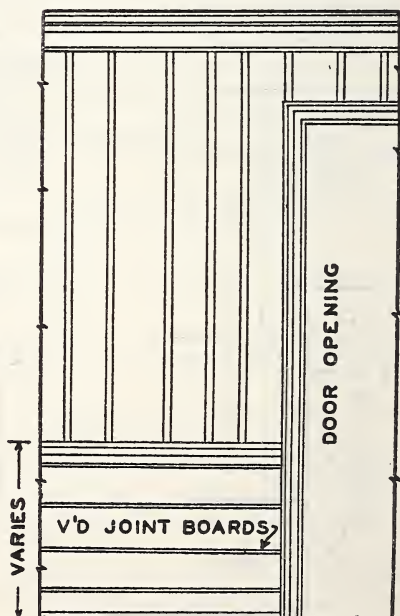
Horizontal paneling to chair rail, vertical above.
